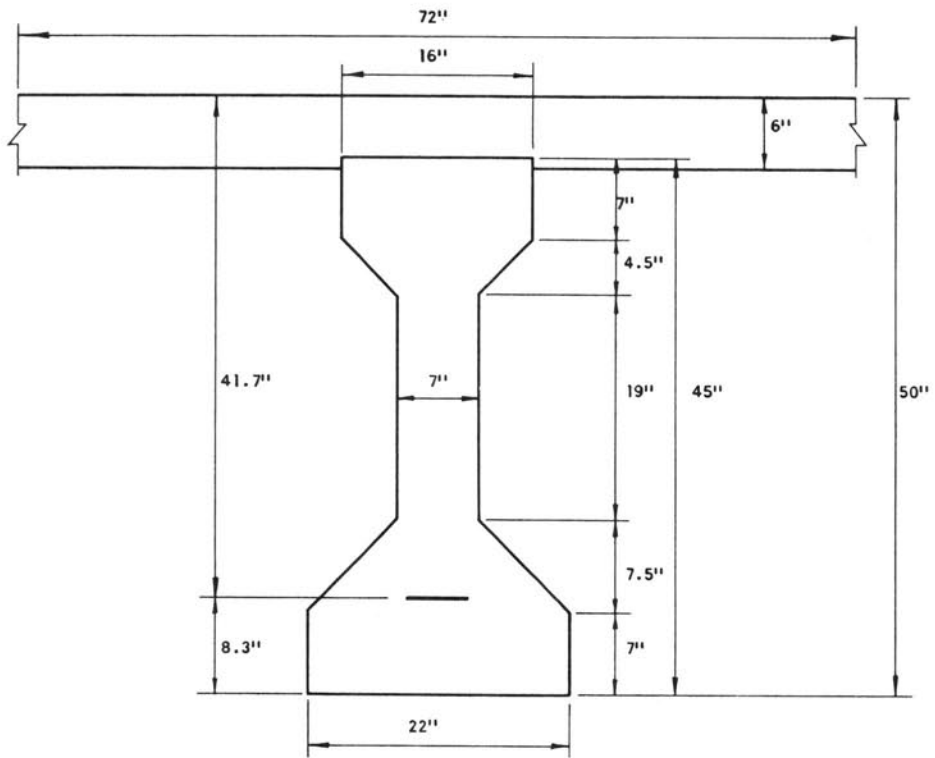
AASHTO TYPE III GIRDER WITH COMPOSITE SLAB
